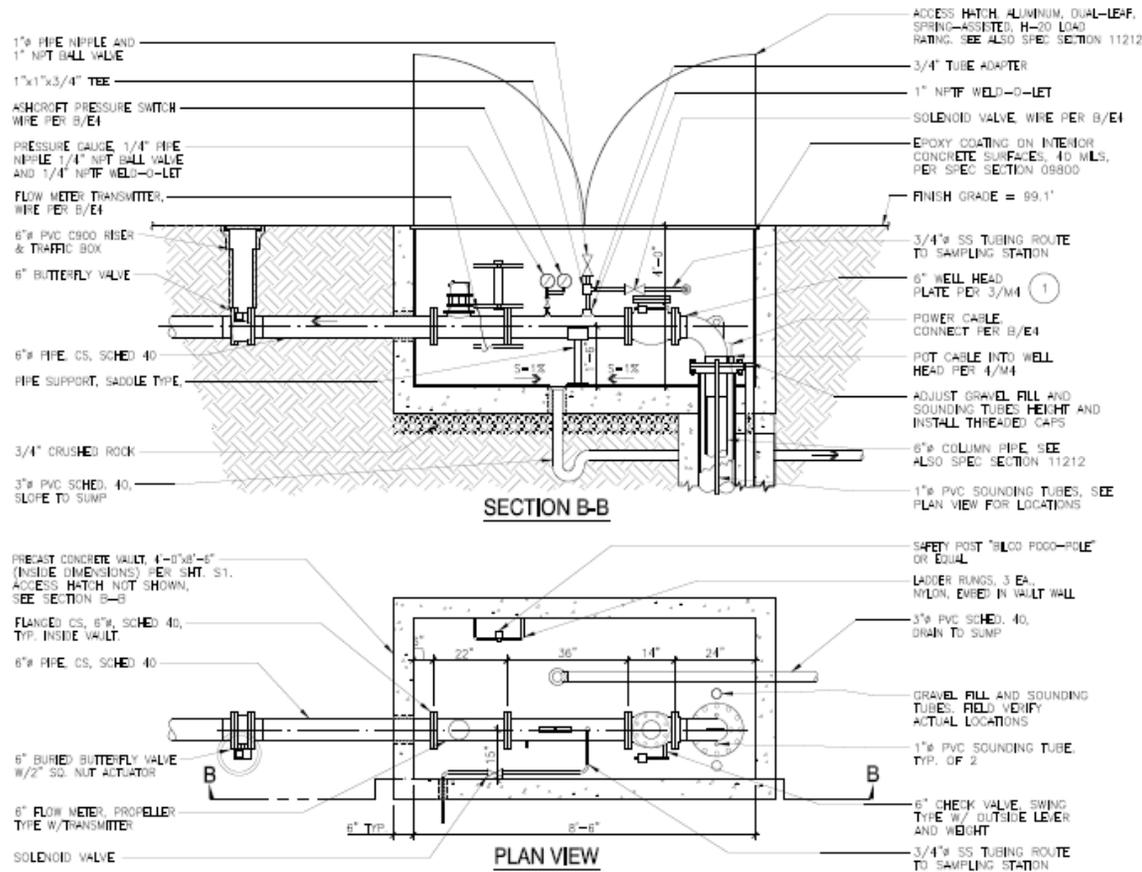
SECTION AND PLAN VIEWS, WELL 4665
